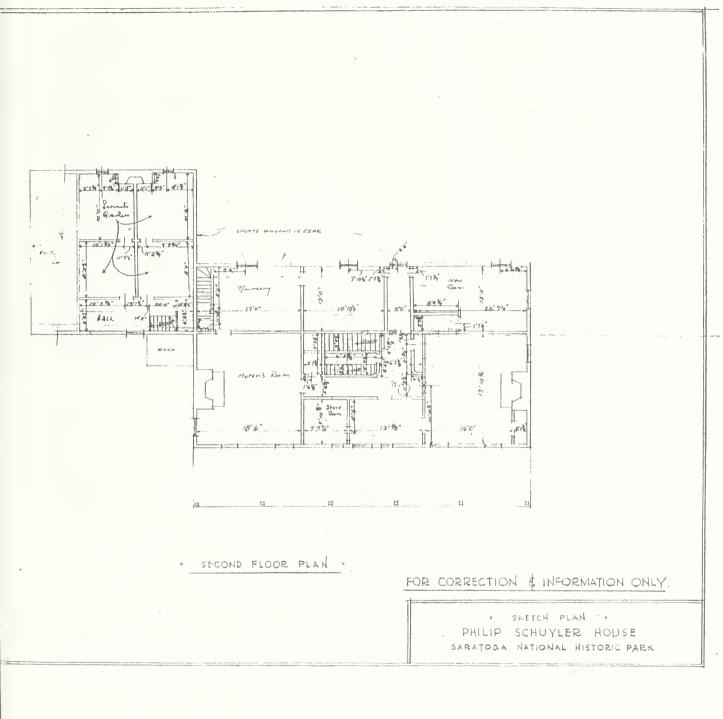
Undated "sketch plan" of the Schuyler House, second story, showing former doorway between the south and hall chambers (circa 1950).
